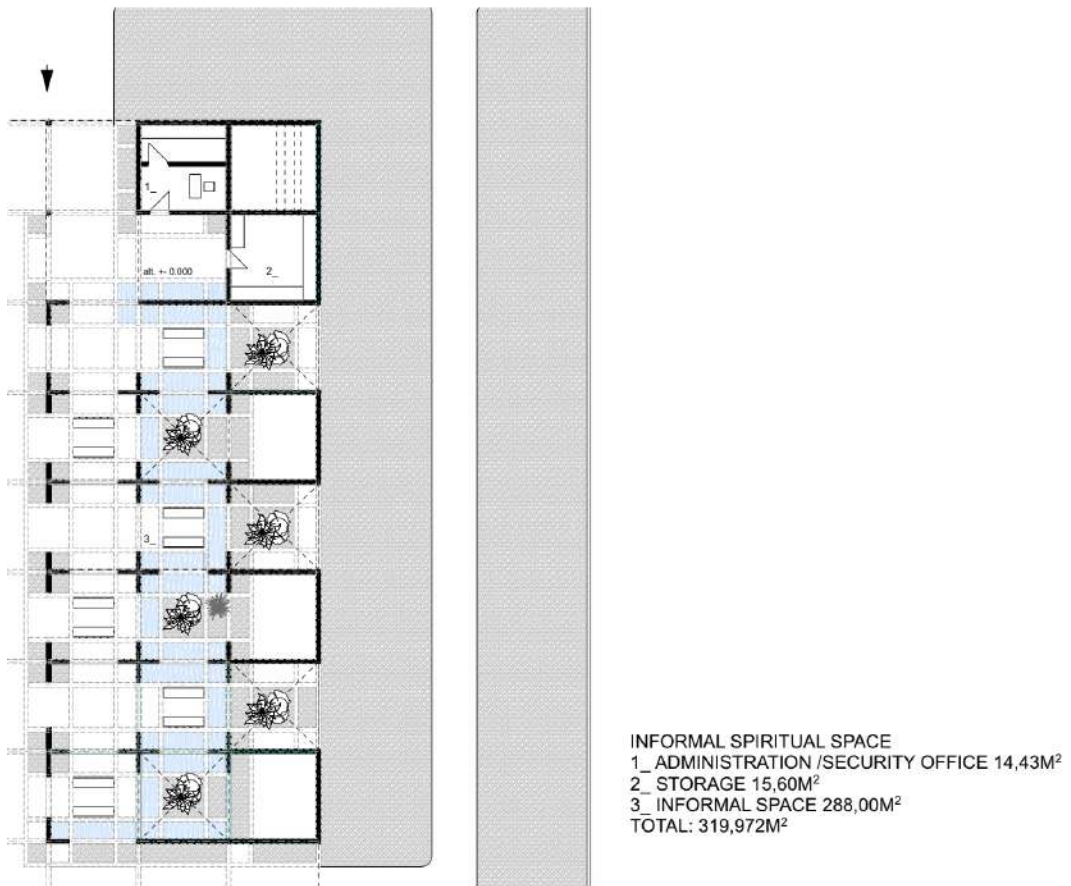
Architectural plan of informal spiritual place in elderly care center proposal
